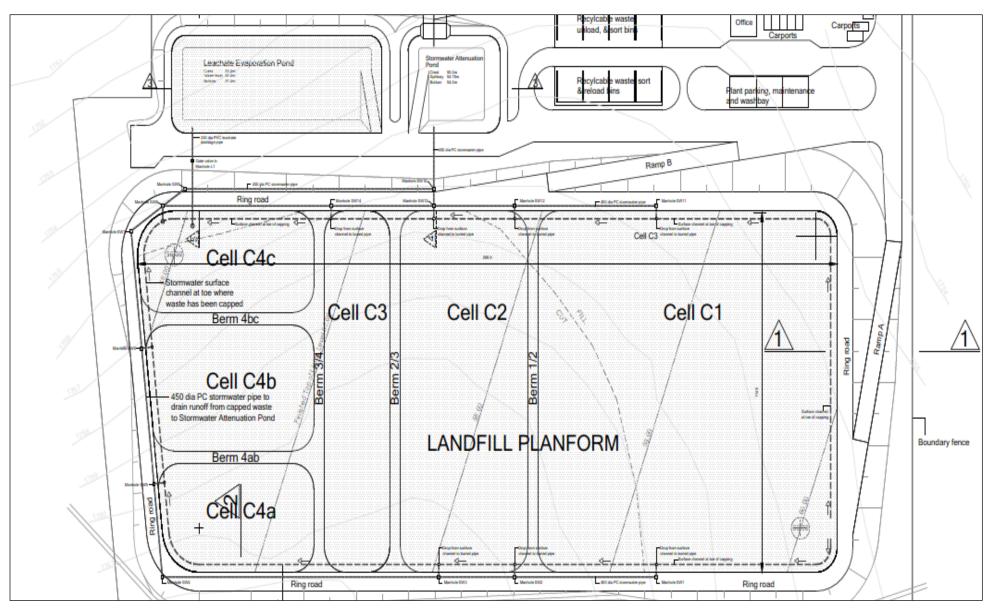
Preliminary layout for the proposed new general waste disposal site
